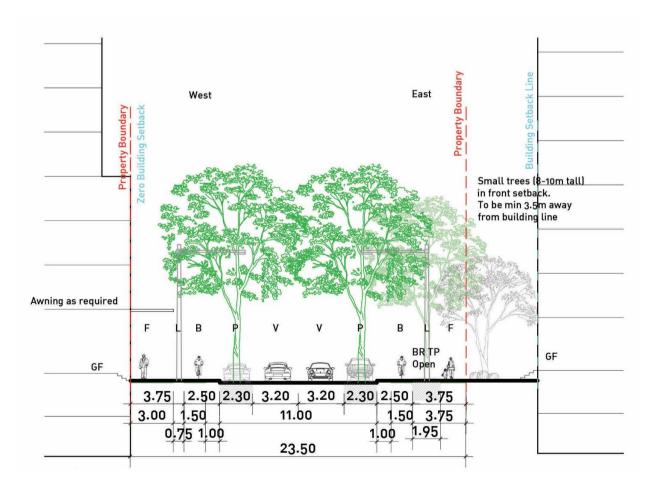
Type 2C Main Road with Cycle Tracks Town Centre Interface (NSR 3)
